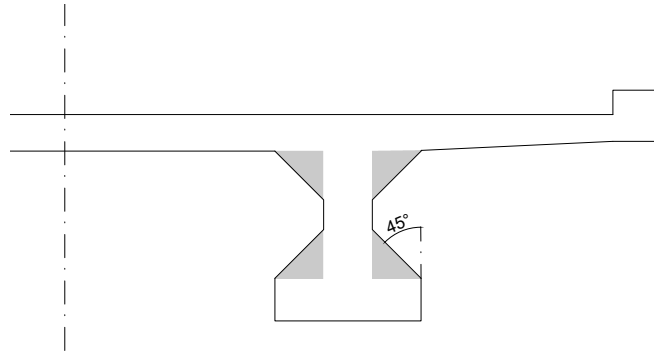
I-girder bridge cross-section with inclined part of flanges marked.
